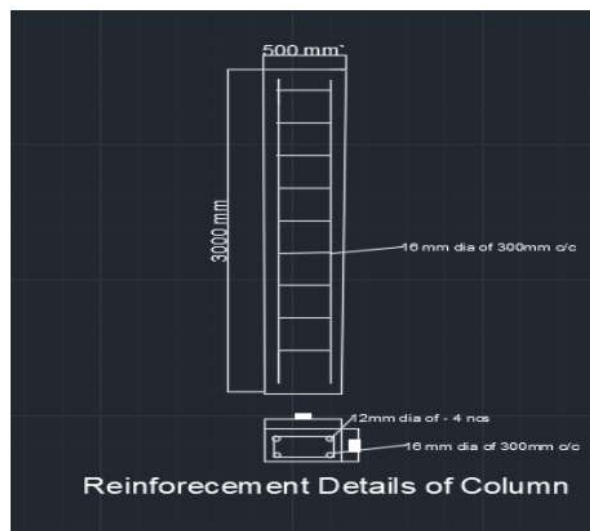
REINFORCEMENT DETAILS FOR COLUMN
